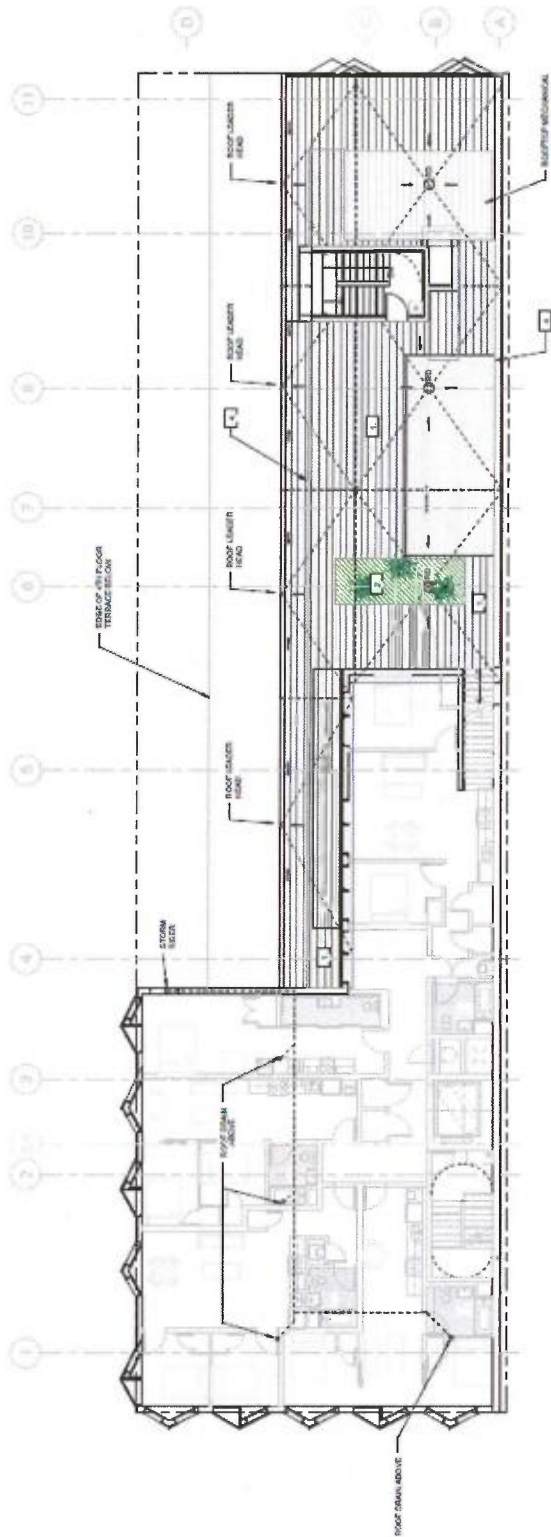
Fifth floor plan (Source: Heller Manus Architects)
